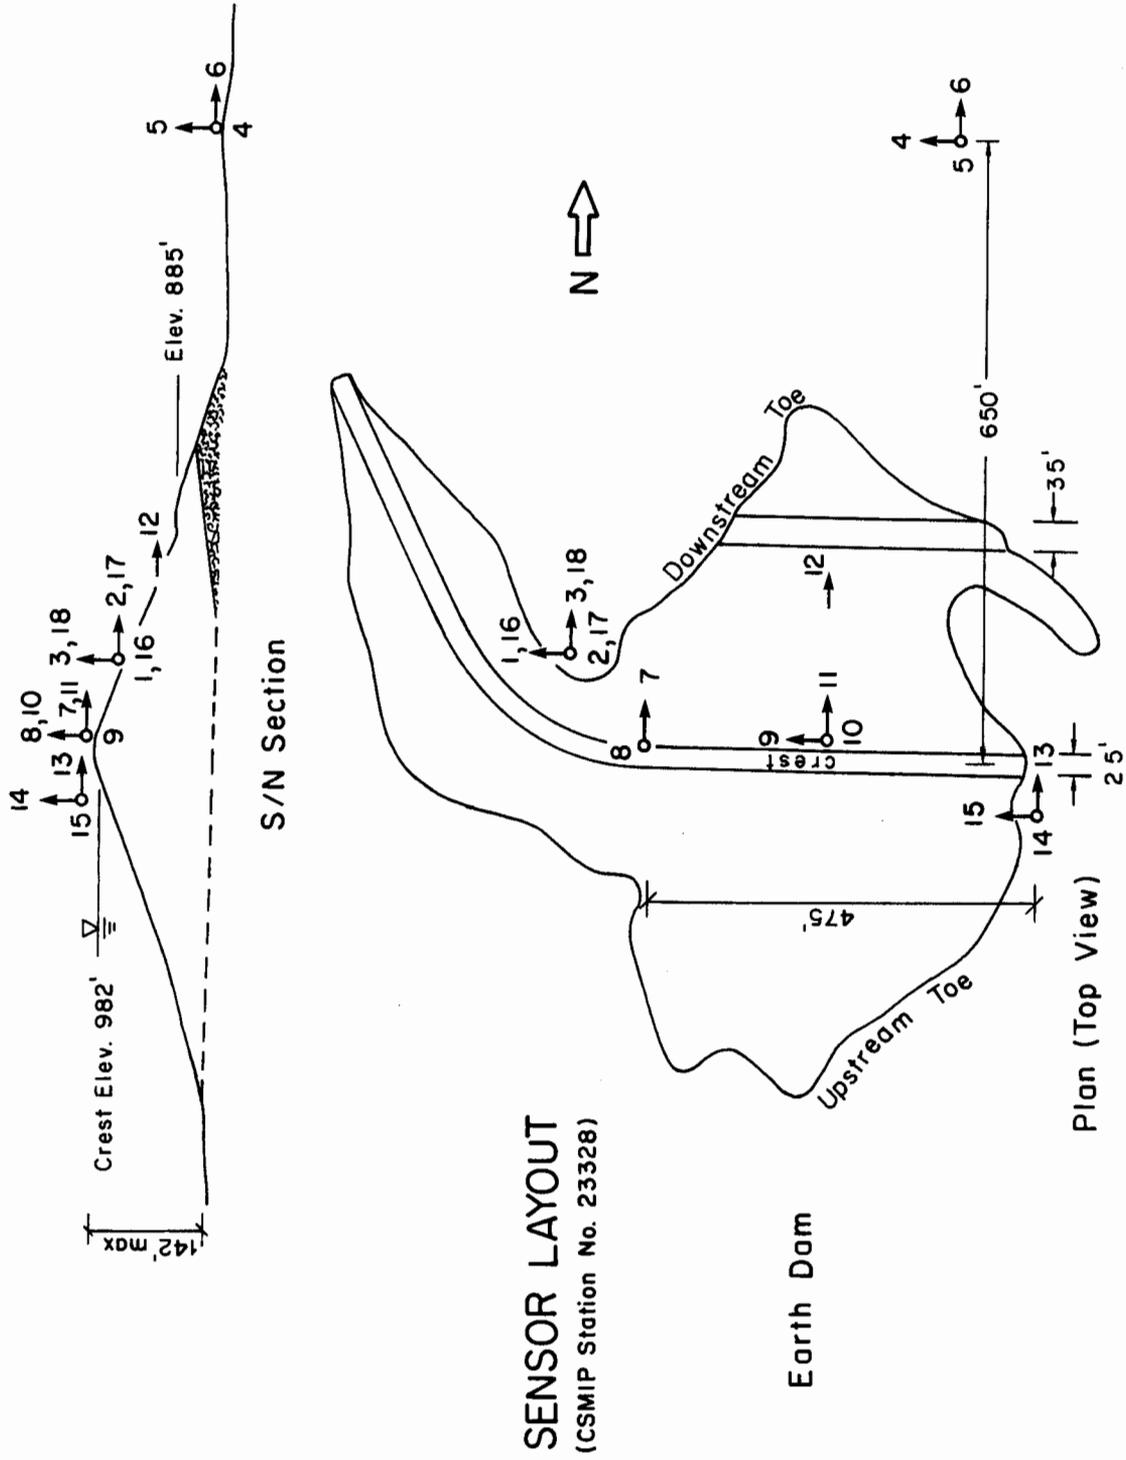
PLAN VIEW OF PUDDINGSTONE MAIN DAM SHOWING SENSOR LOCATIONS
